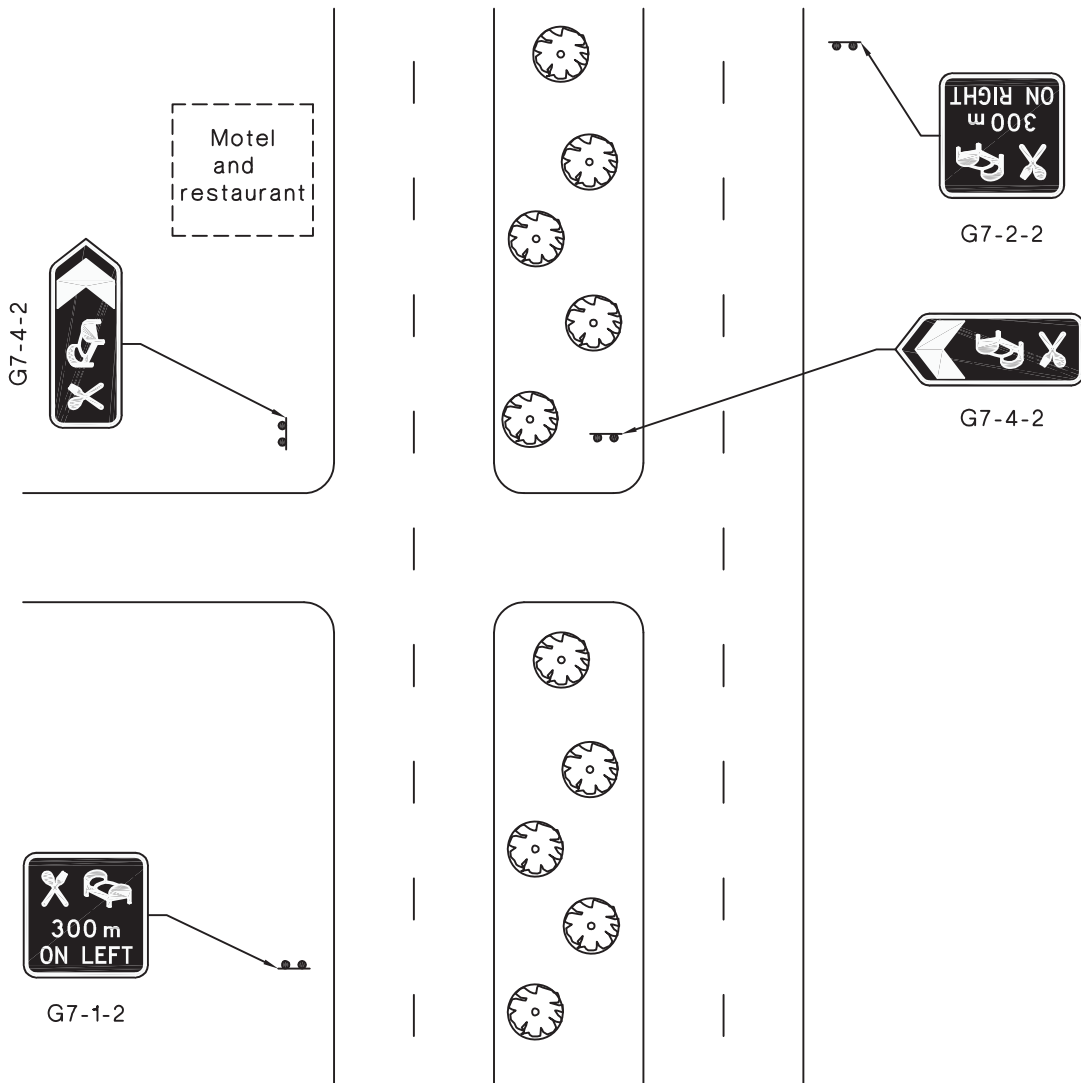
EXAMPLE OF SERVICES ON A DIVIDED ROAD
